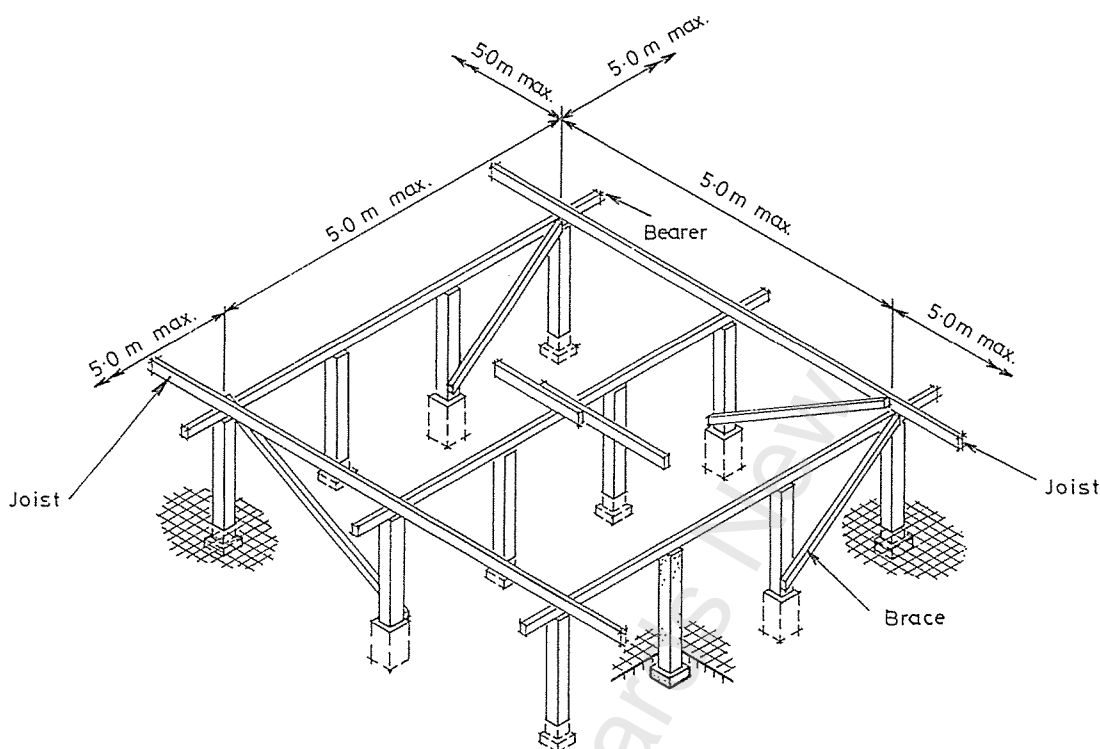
Lines of horizontal support containing diagonal timber braces between piles
